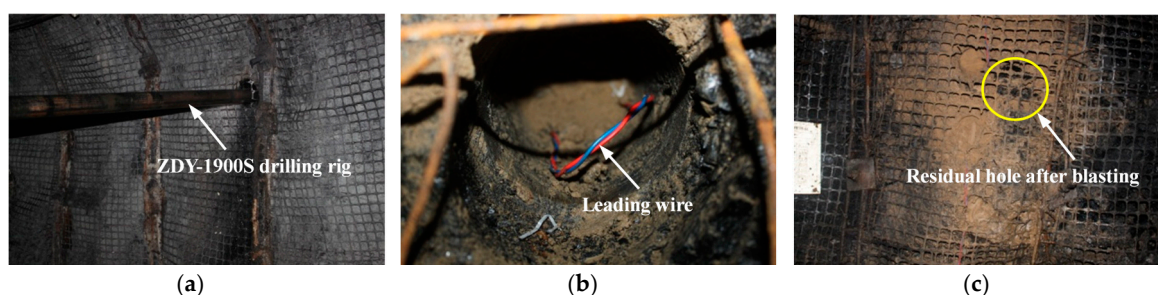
Practical application of DHB at the 4301 working face. (a) Blasting hole drilling; (b) Blasting hole charging; (c) Residual hole after blasting.
